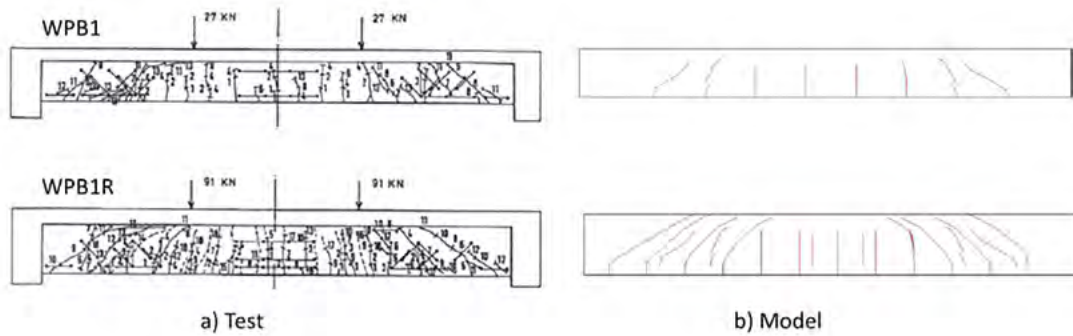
Crack pattern under first damage (WPB1) and repaired structure at failure (WPB1R). a) Experimental observation, b) Model prediction.
